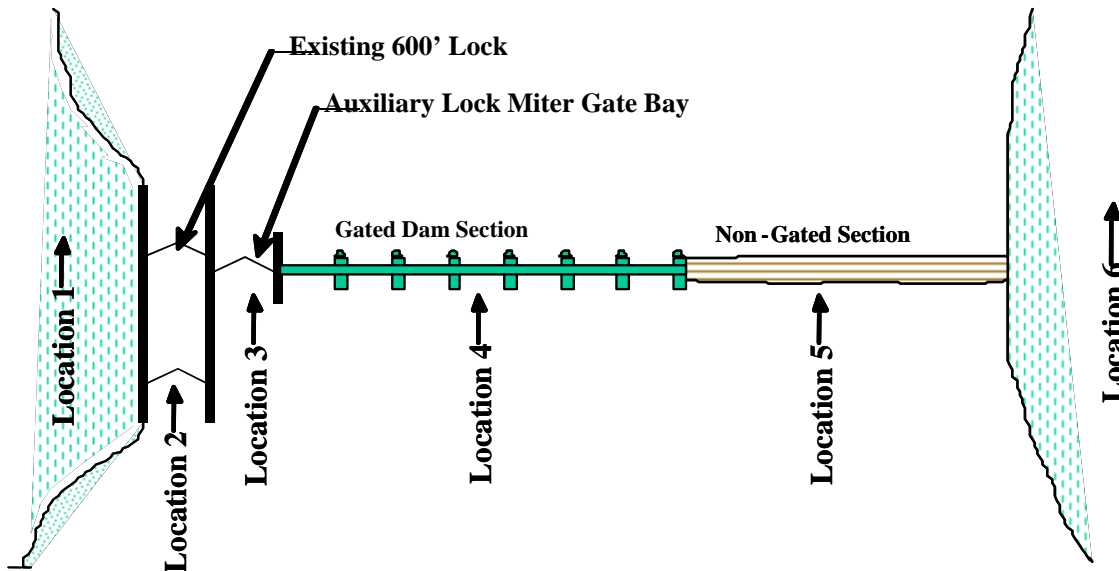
Example of alternative new lock locations at a typical existing lock and dam site.
